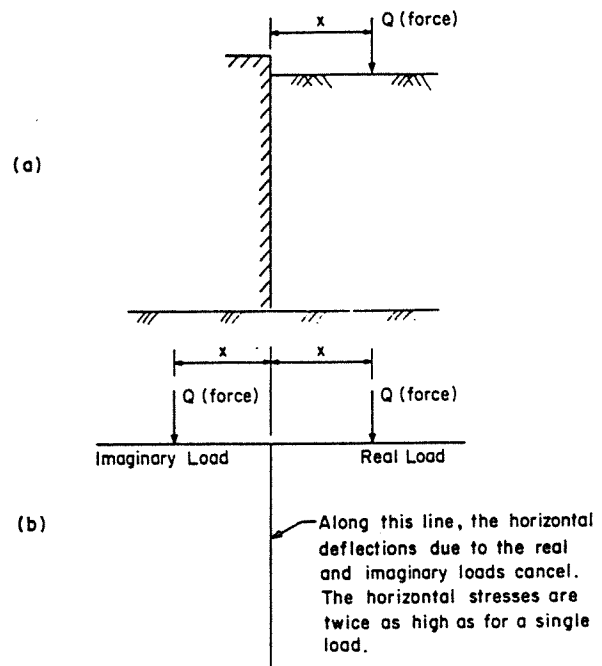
Use of an imaginary load to enforce a zero-displacement condition at a wall. (a) A point load near a wall. (b) Two point loads on an elastic half-space.
